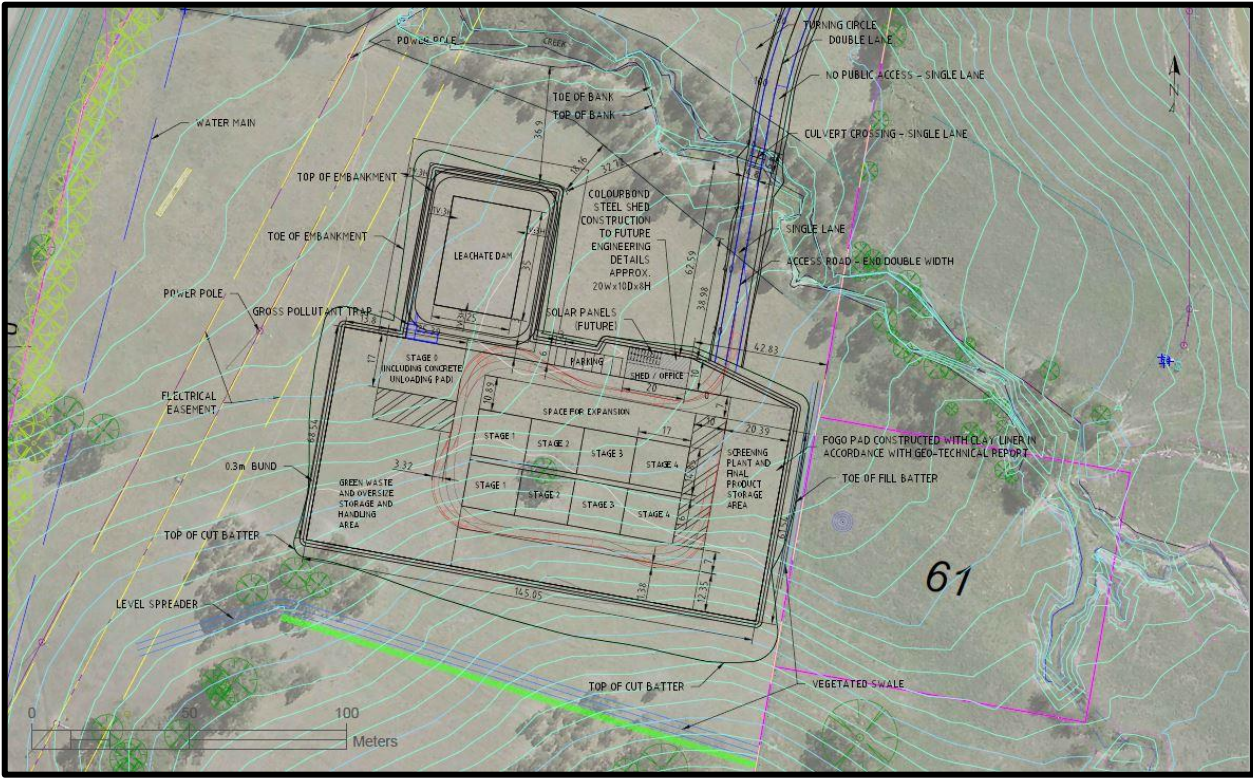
Layout of Proposed Composting Facility (Source: Snowy Valleys Council)
